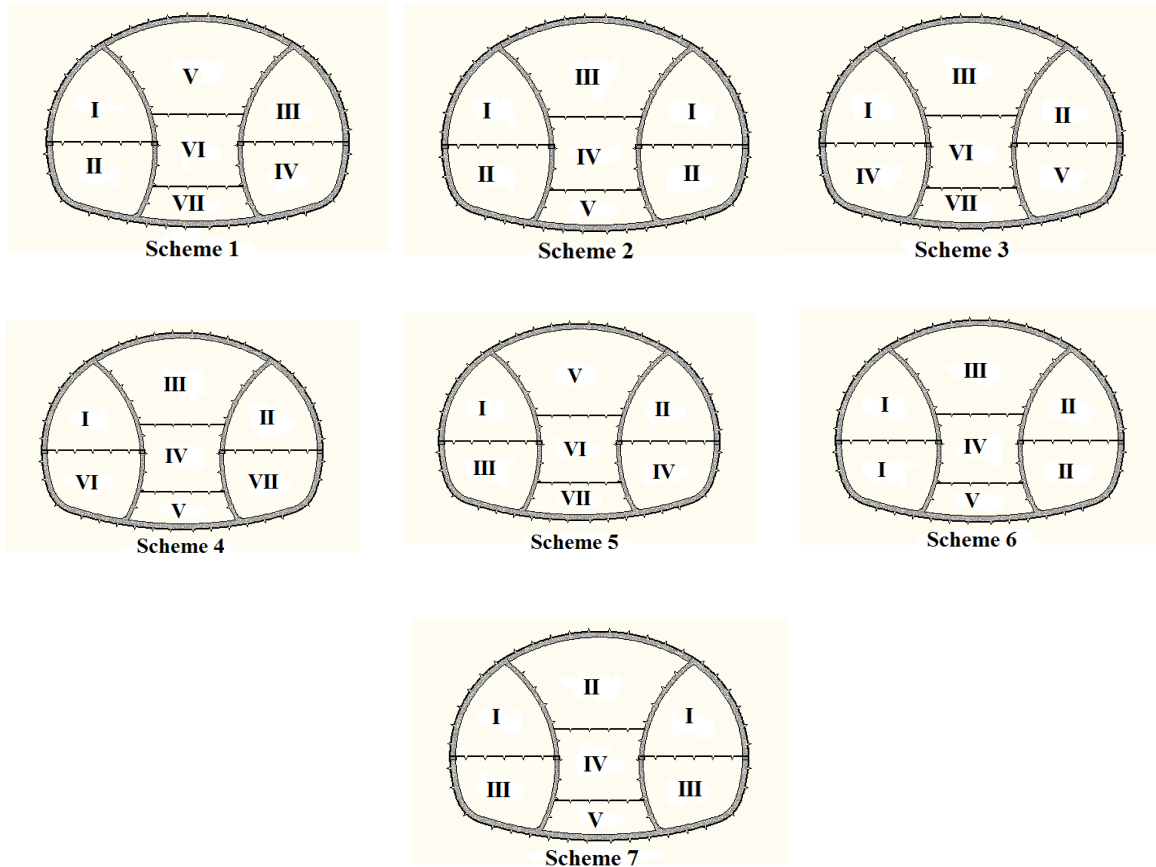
Excavation schemes proposed for Niayesh tunnel based on side drift method
